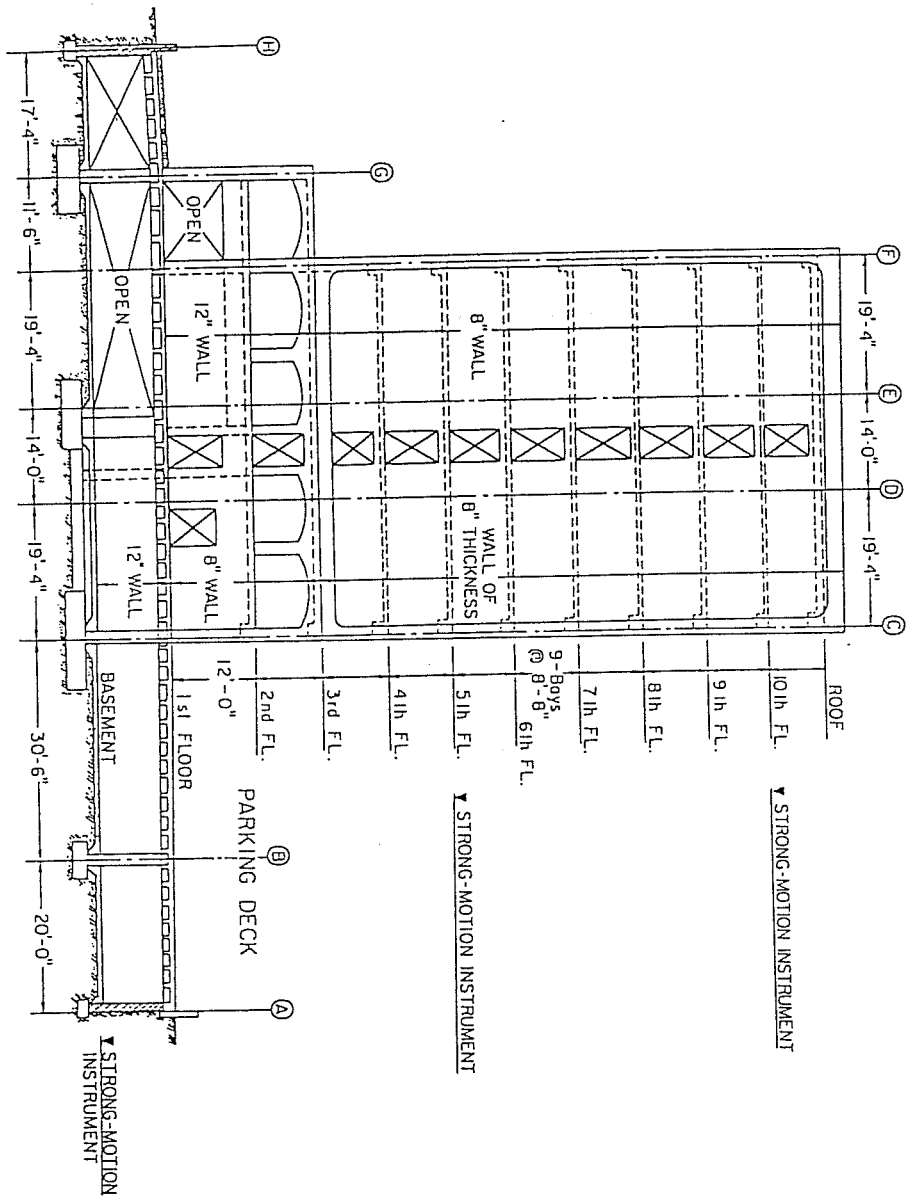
Elevation of the building in Transverse Direction⁴⁹
